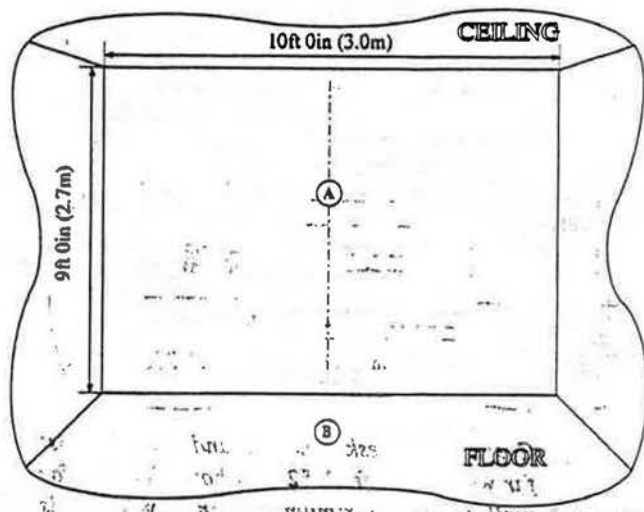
Case No. V, bare room; A 5 ft (1.52 m) above floor on far wall where maximum terminal velocity is found, B on floor 2.5 ft (0.8 m) from far wall in line with A.
